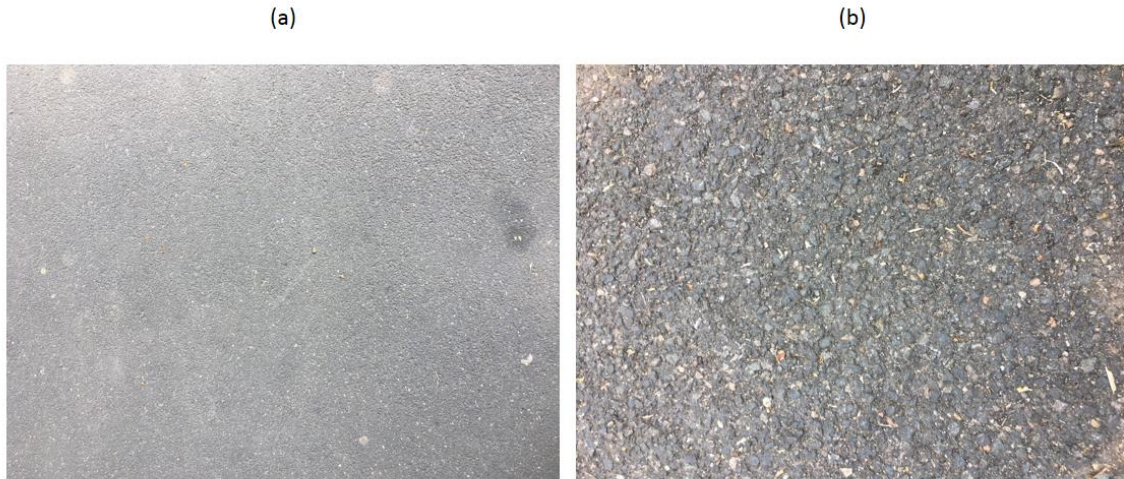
(a) The sidewalk surface (b) The parking lot surface
